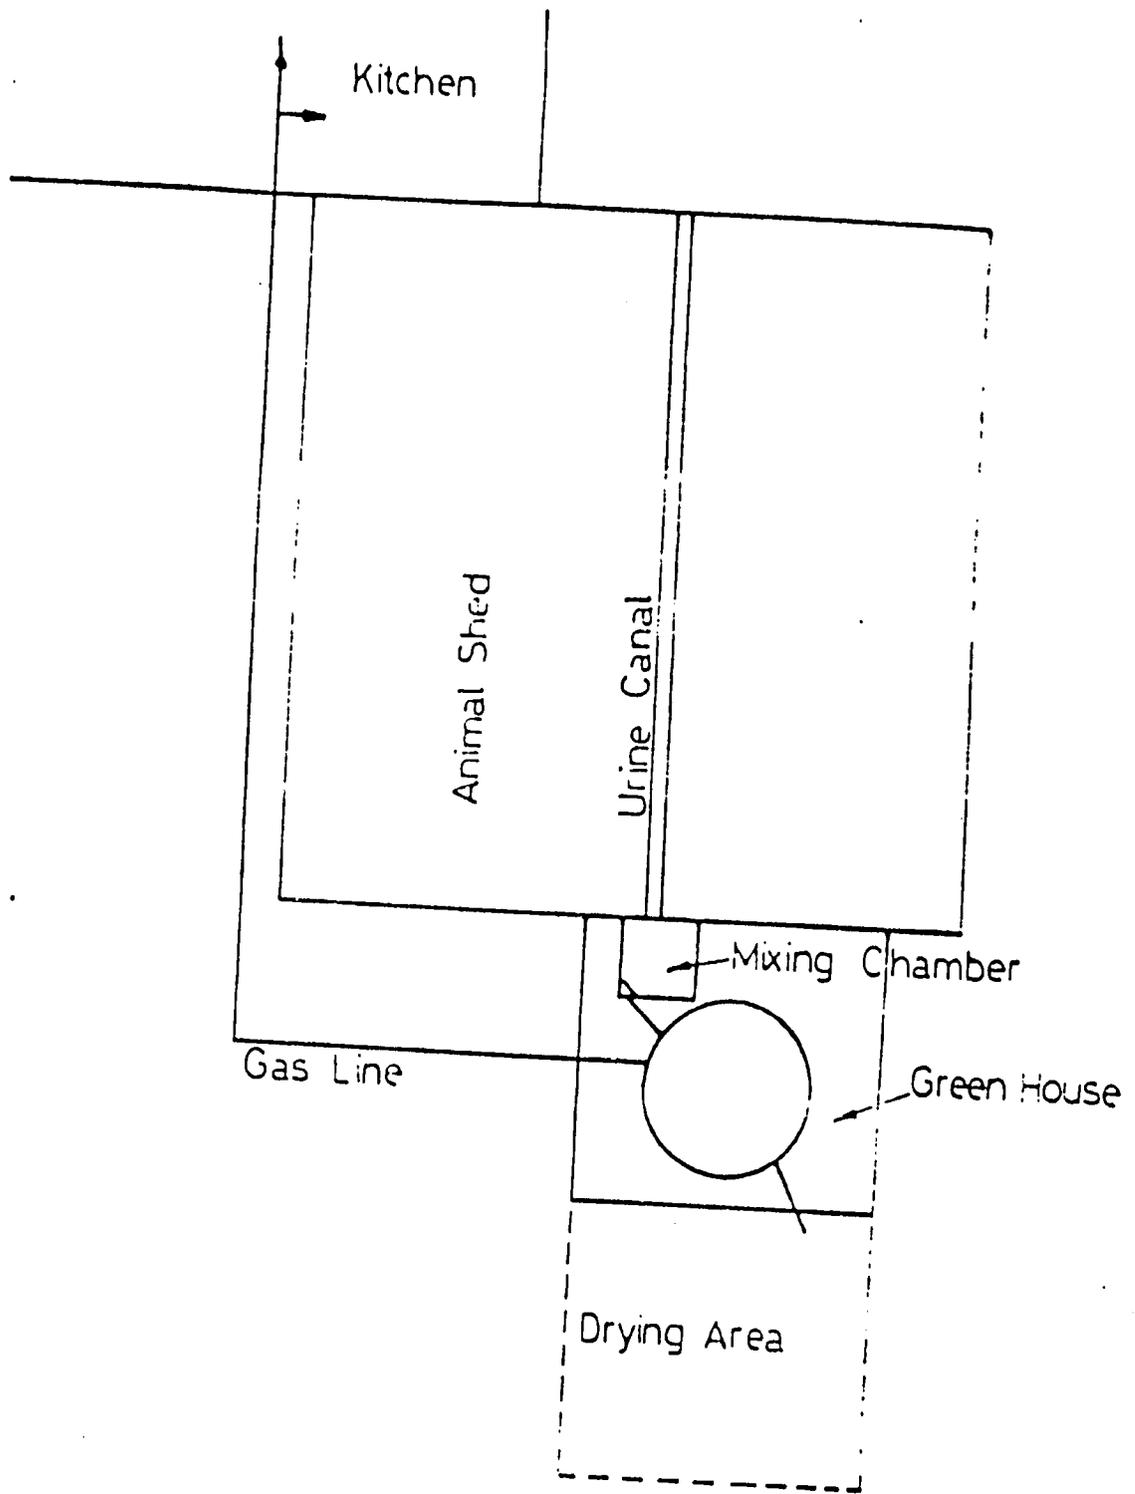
Plant Layout of the Borda Type Digester (Maroi-Meet Kados).
